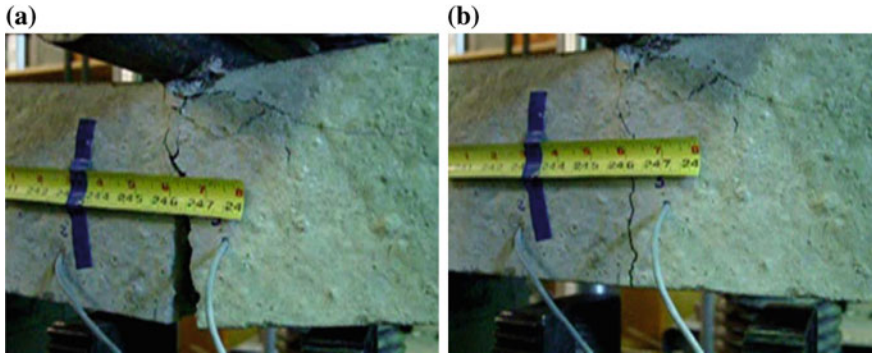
a Cracks at the bottom surface during a loading test b Cracks close up after applying electrical currents
